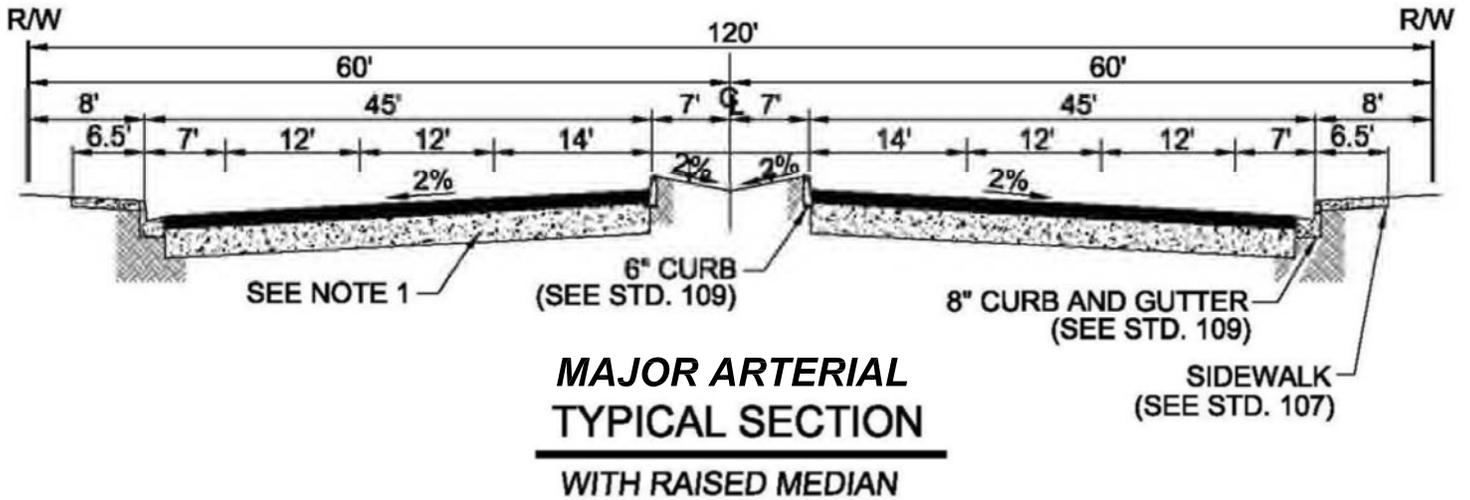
(2 of 2): CITY OF CHINO HILLS GENERAL PLAN ROADWAY CROSS-SECTIONS
